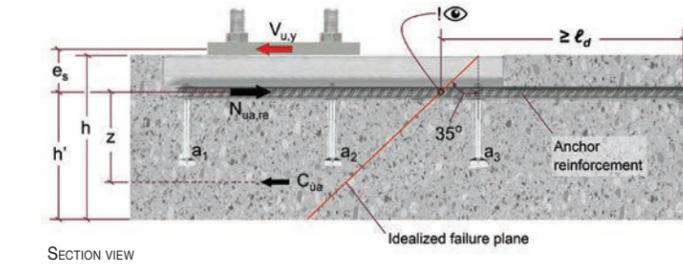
Anchor reinforcement to preclude concrete breakout in shear acting along the longitudinal axis of the anchor channel
